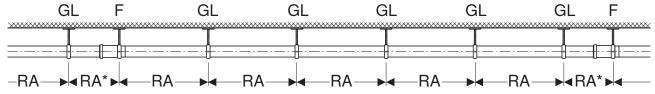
Pipe bracket spacing RA when fastening to ceilings and horizontally to walls, without support shells
